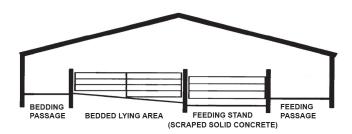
bedded house with sloped concrete floor.
